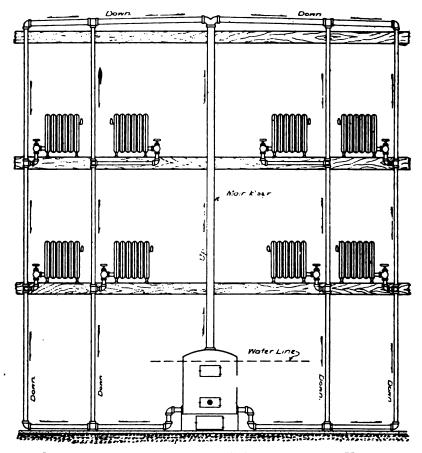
The Overhead or "Mills" System of Steam Heating.
